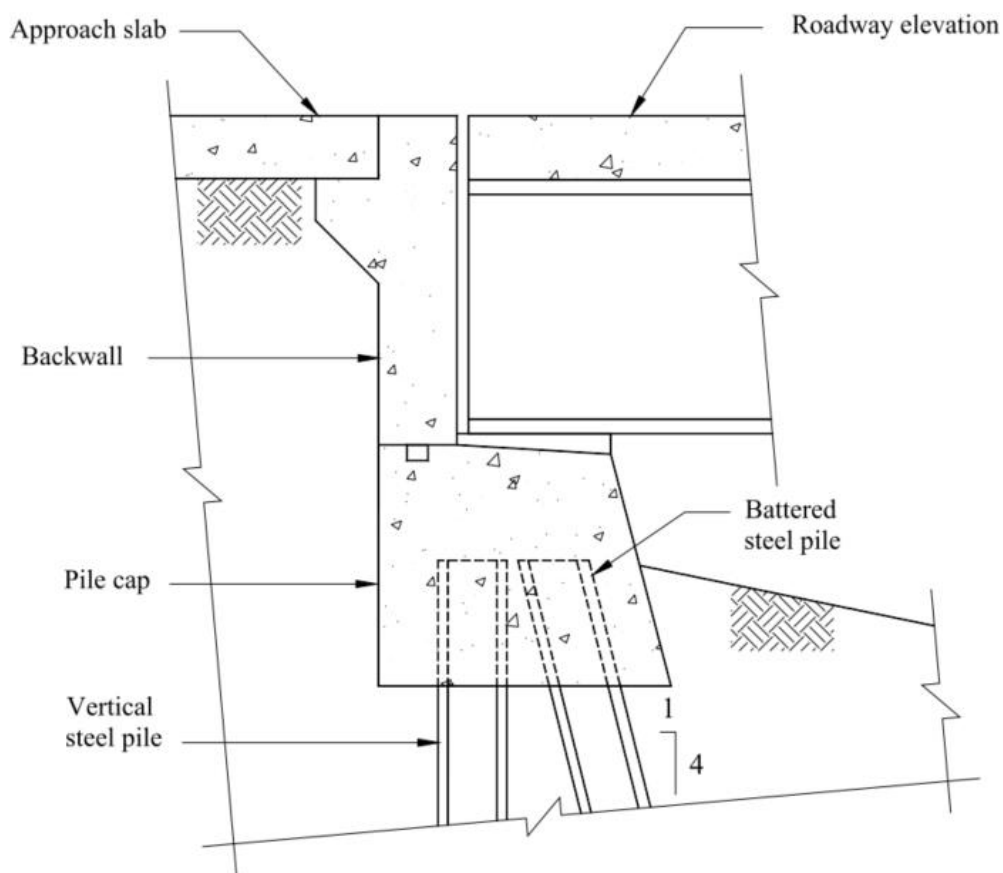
Typical bridge abutment system (Klaiber et al. 2004)
